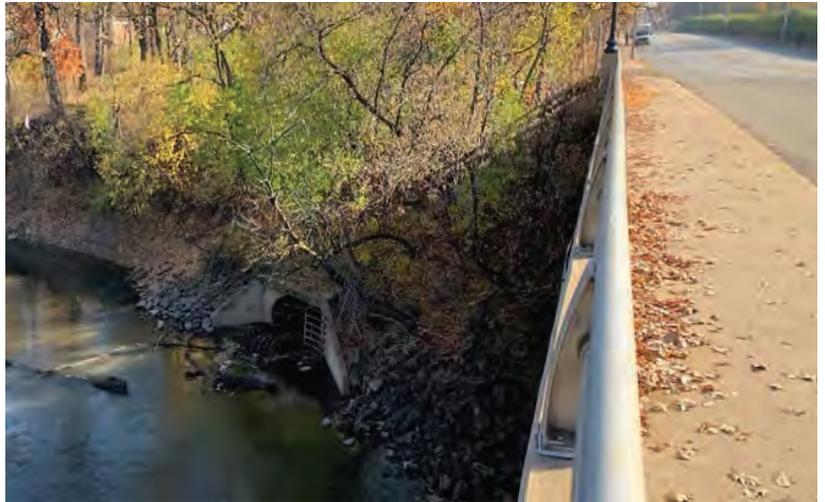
Combined Sewer Overflow Outfall at Madison Street
